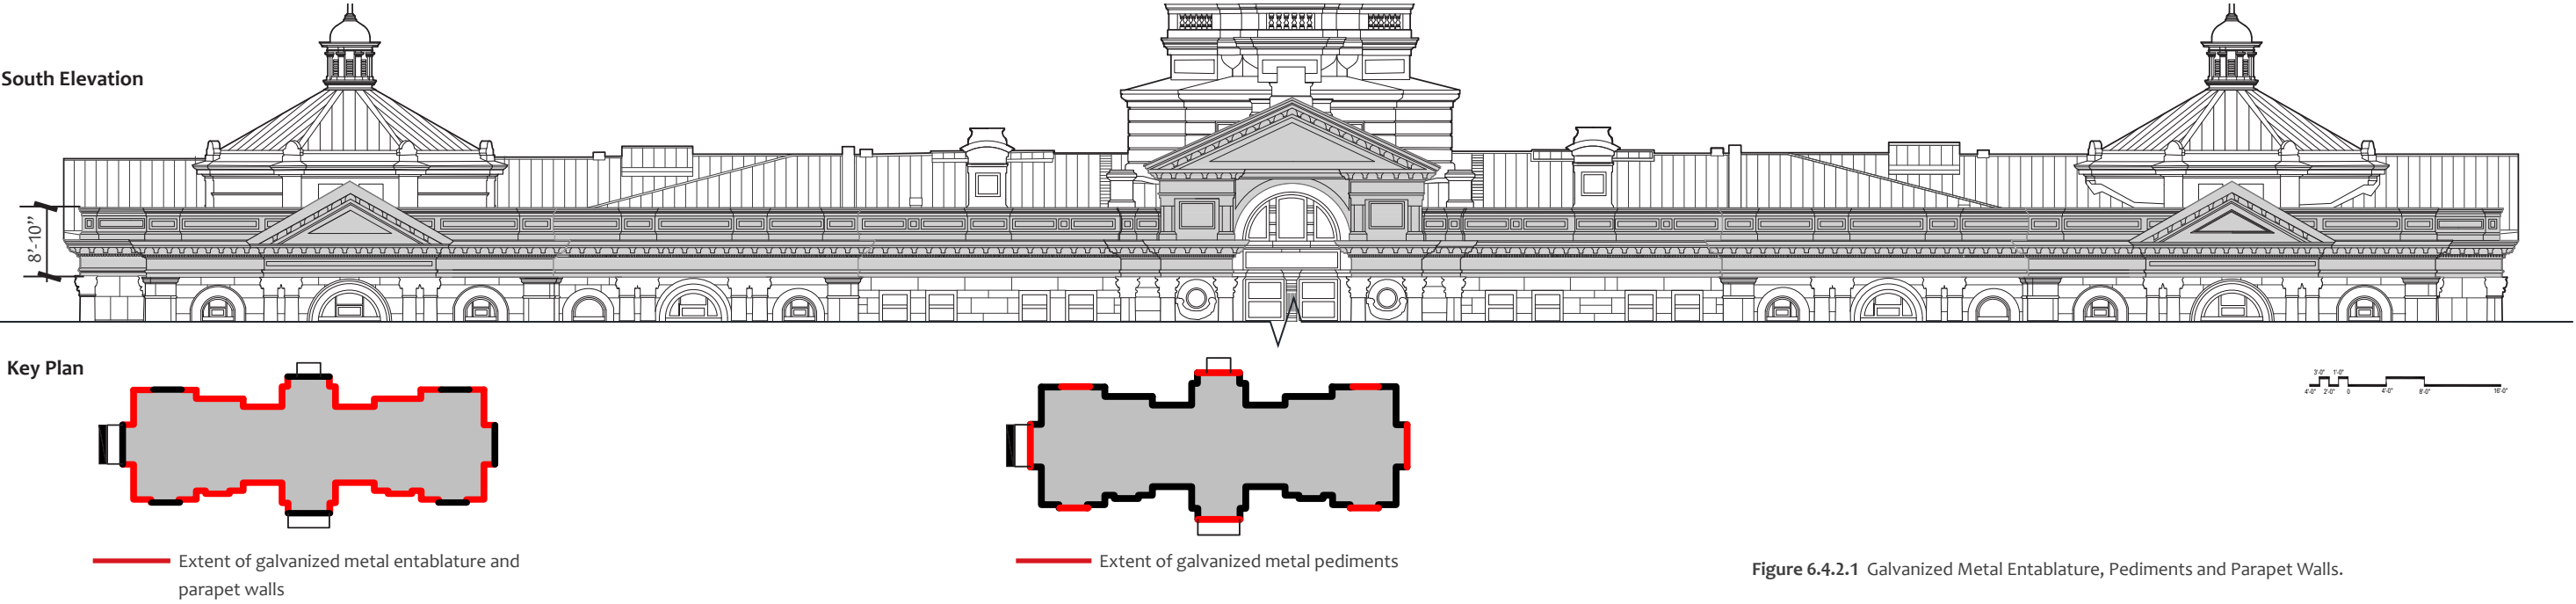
Galvanized Metal Entablature, Pediments and Parapet Walls.
